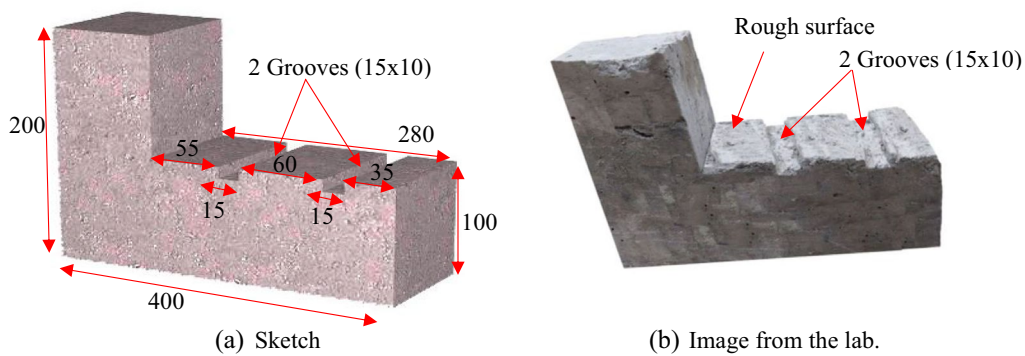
Grooves arrangement and dimensions (all dimensions in mm)
